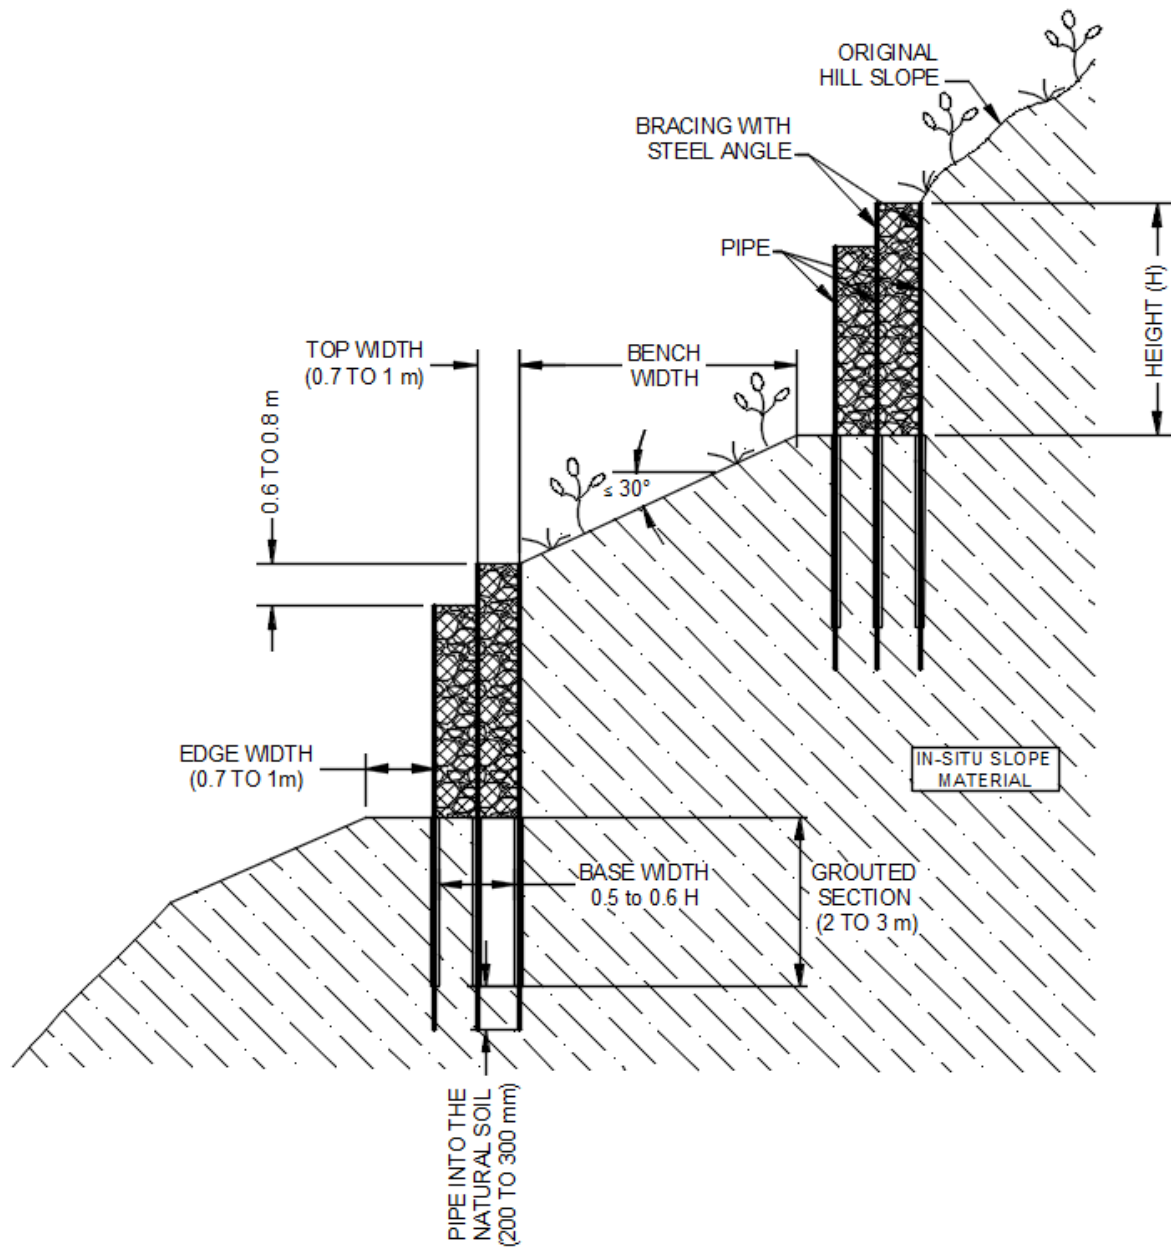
SECTIONAL VIEW OF A TWO LEVEL PERIPHERAL REINFORCED GABION WALL (PRGW)
